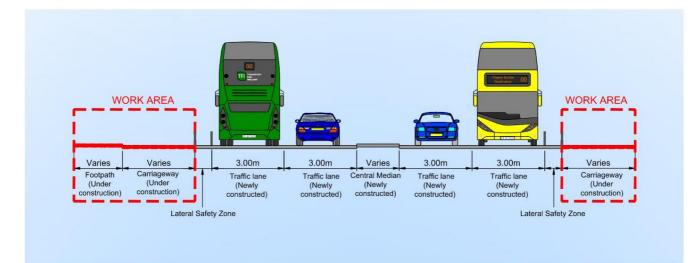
Traffic Management Cross Section, Section 3a – Stage 2
